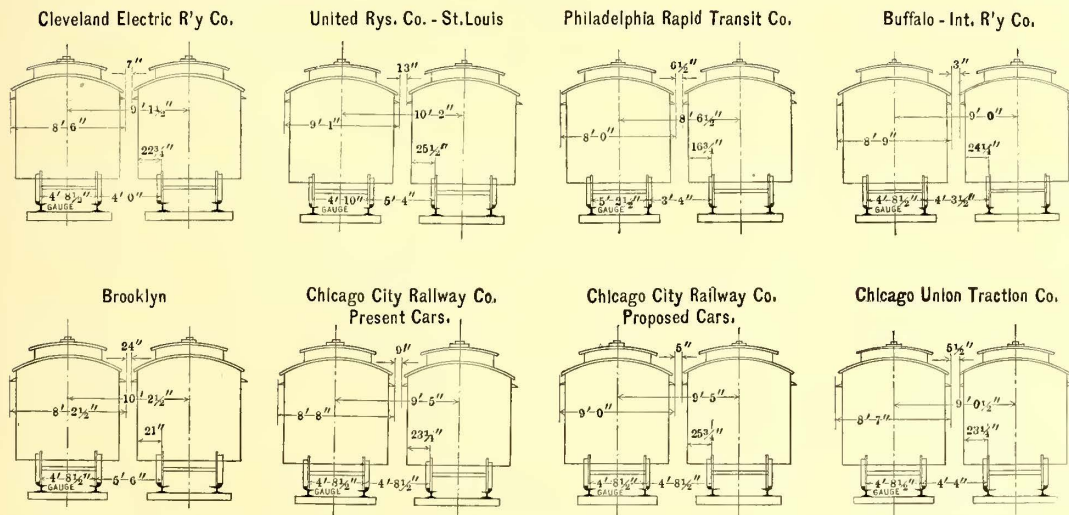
CONVENTIONAL DRAWING, SHOWING DIMENSIONS OF CARS AND CLEARANCES ON DIFFERENT ROADS
